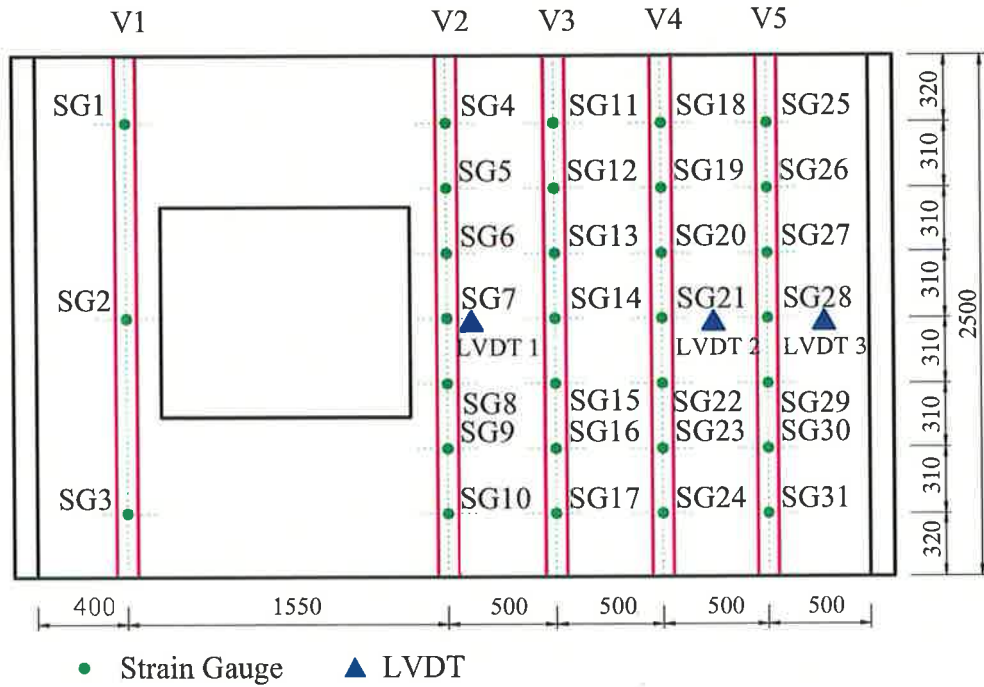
(a) Test scheme and instrumentation layout of Wall 3
